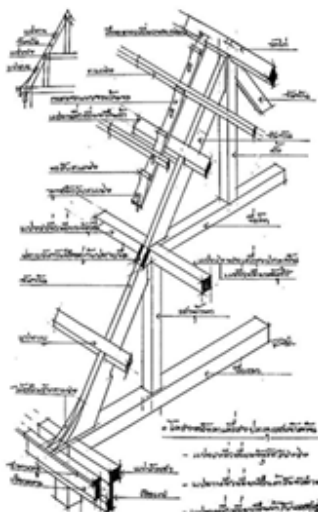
Pradu with rafter roof framing used as roofing structure of the throne hall
